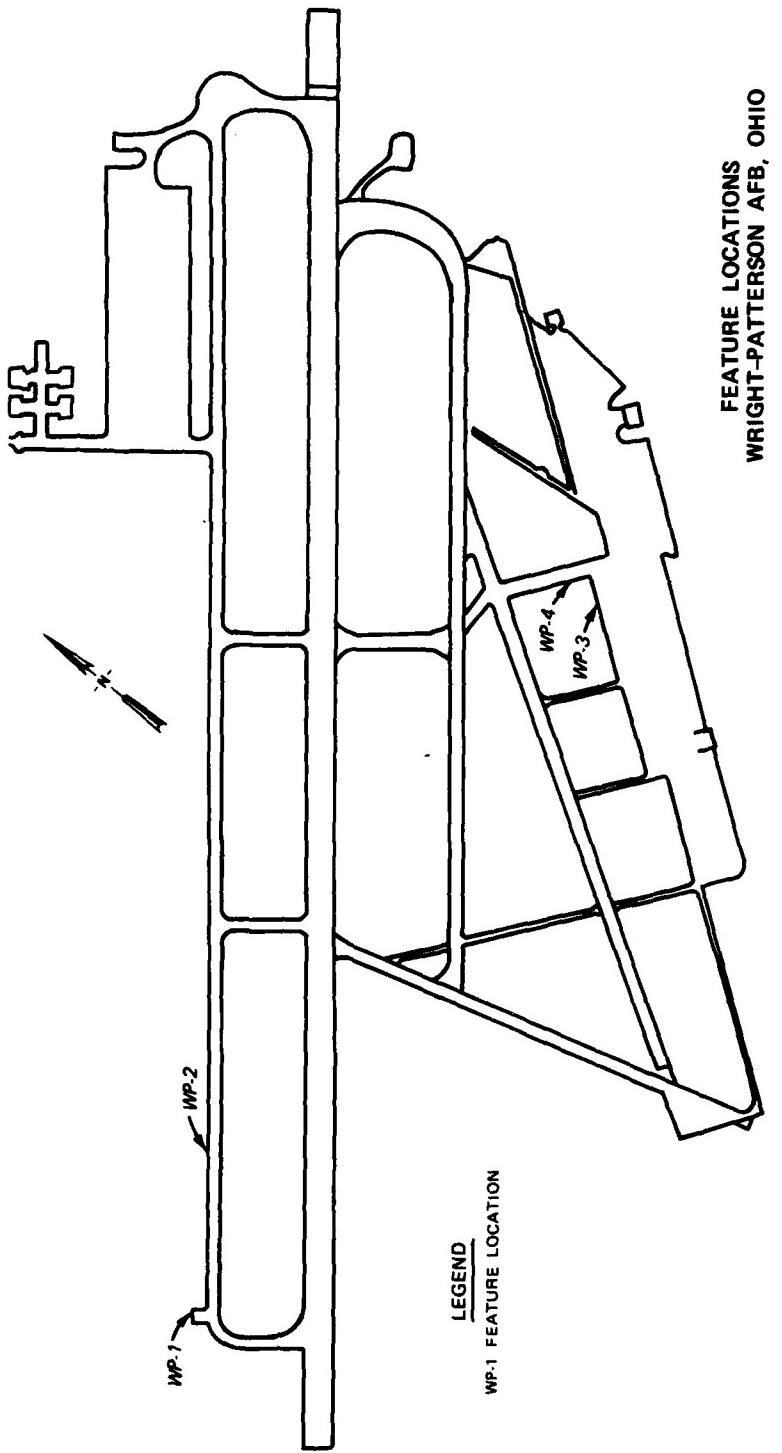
Layout of Airfield Pavement Showing Locations of the Test Features
